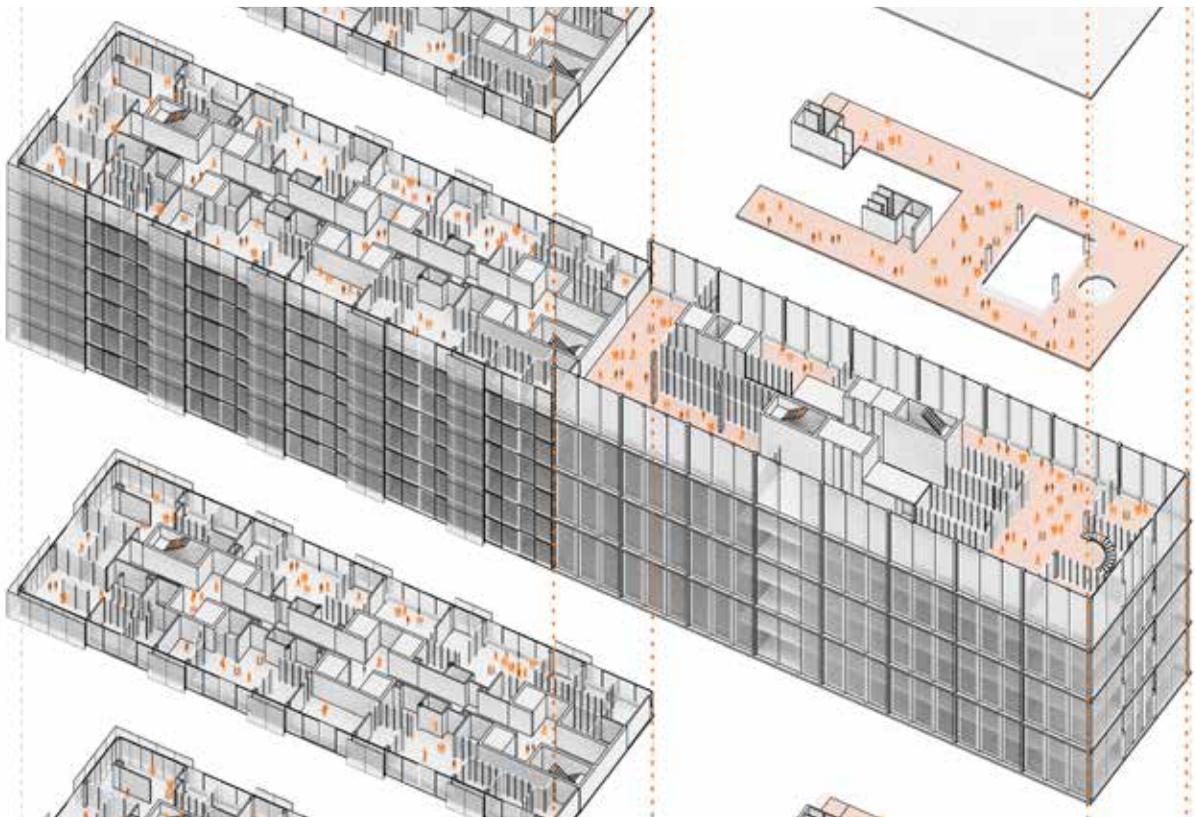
IMAGE: ZOOM IN EXPLODED VIEW PROTOTYPE 1. VANNUT HANNAH
